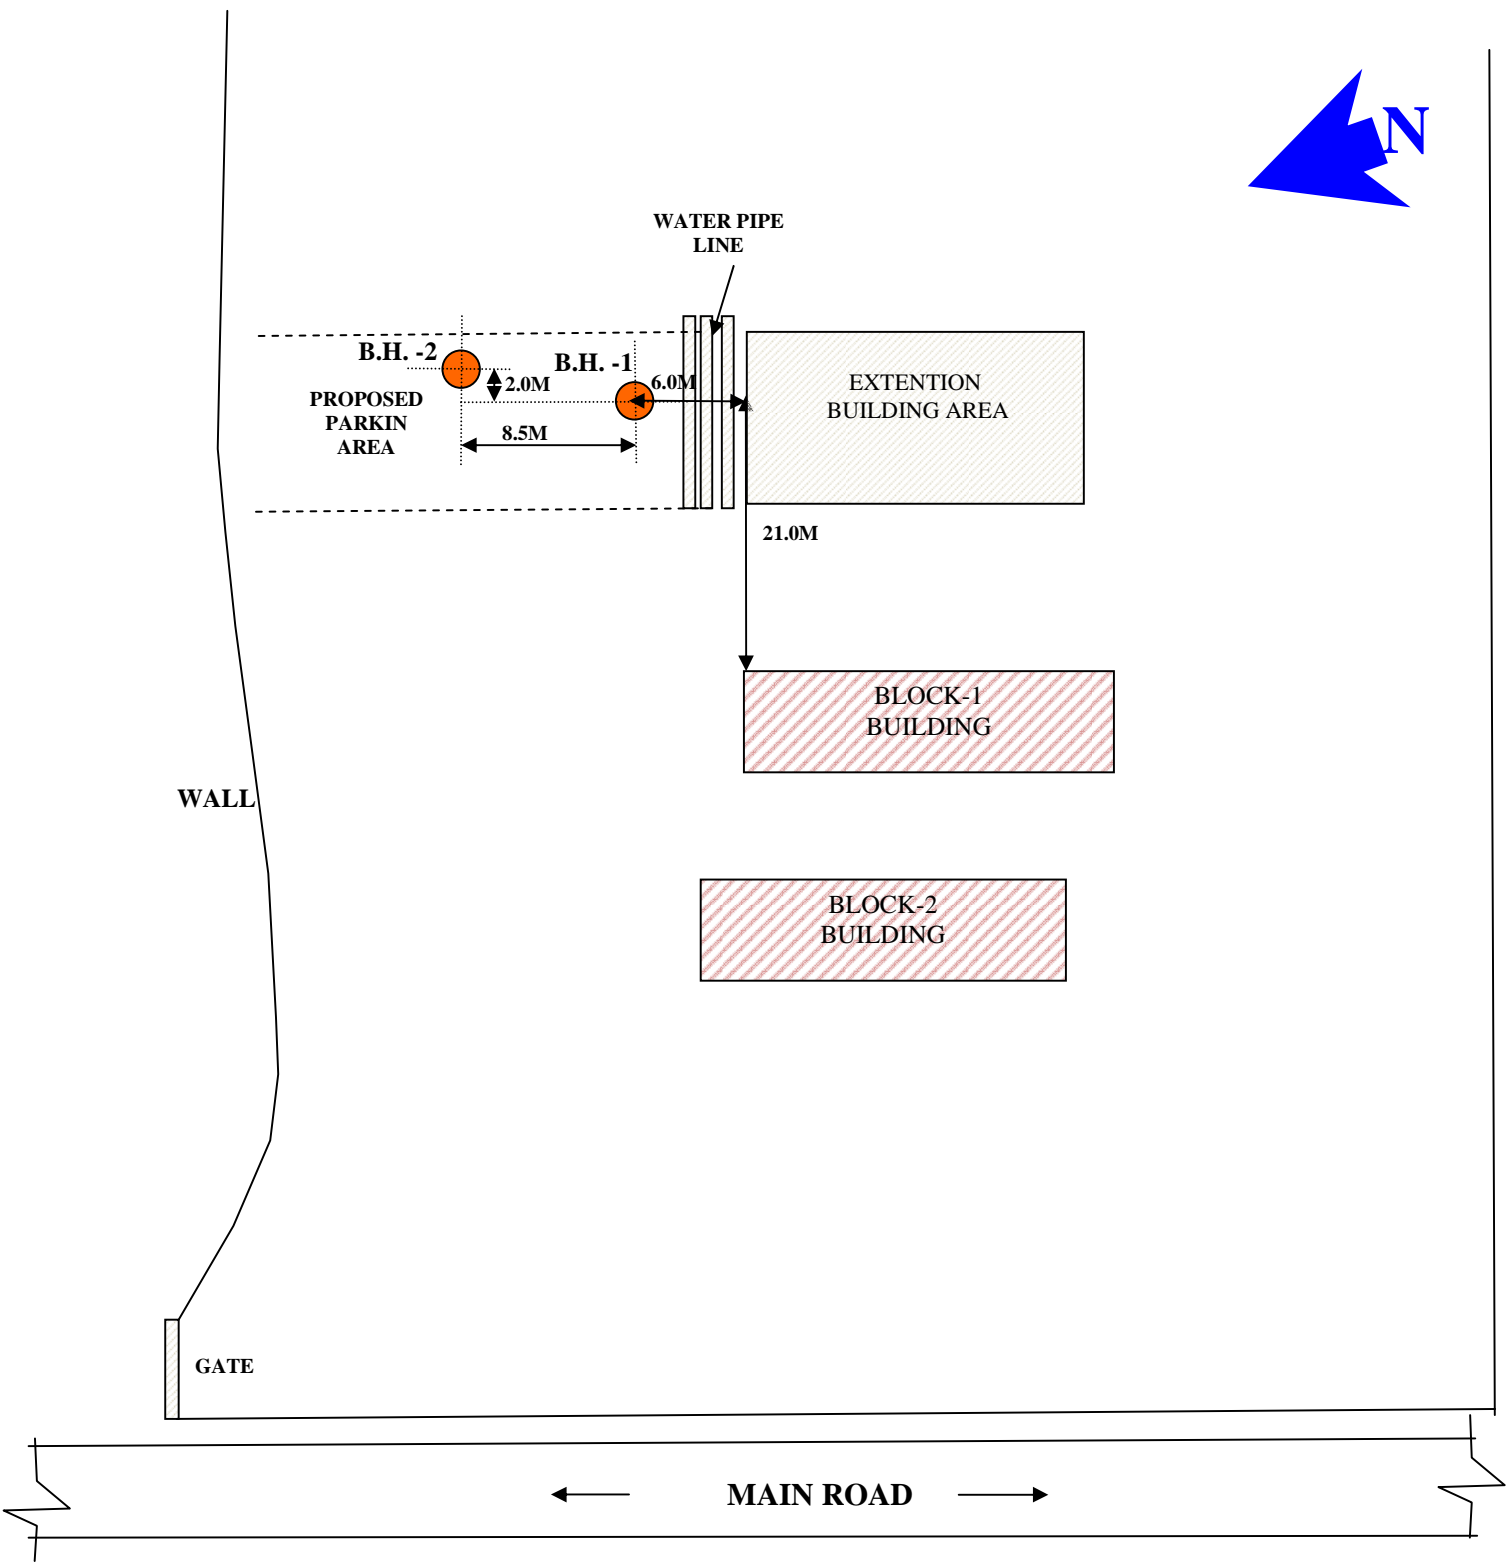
Site plan showing the layout of boreholes(not to scale)
